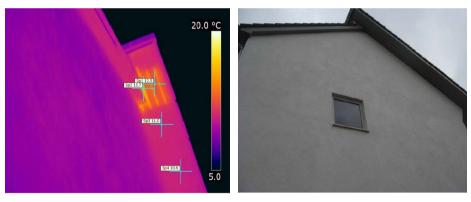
Left: Plot 7 side upper elevation thermogram indicating heat losses through the roof apex. Right: Plot 7 side upper elevation digital photo.
